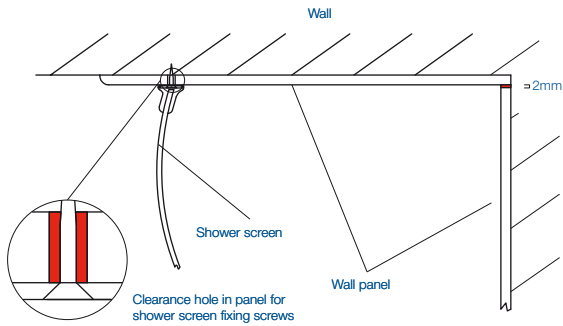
Panelling a shower before the enclosure is fixed without using an internal corner section
